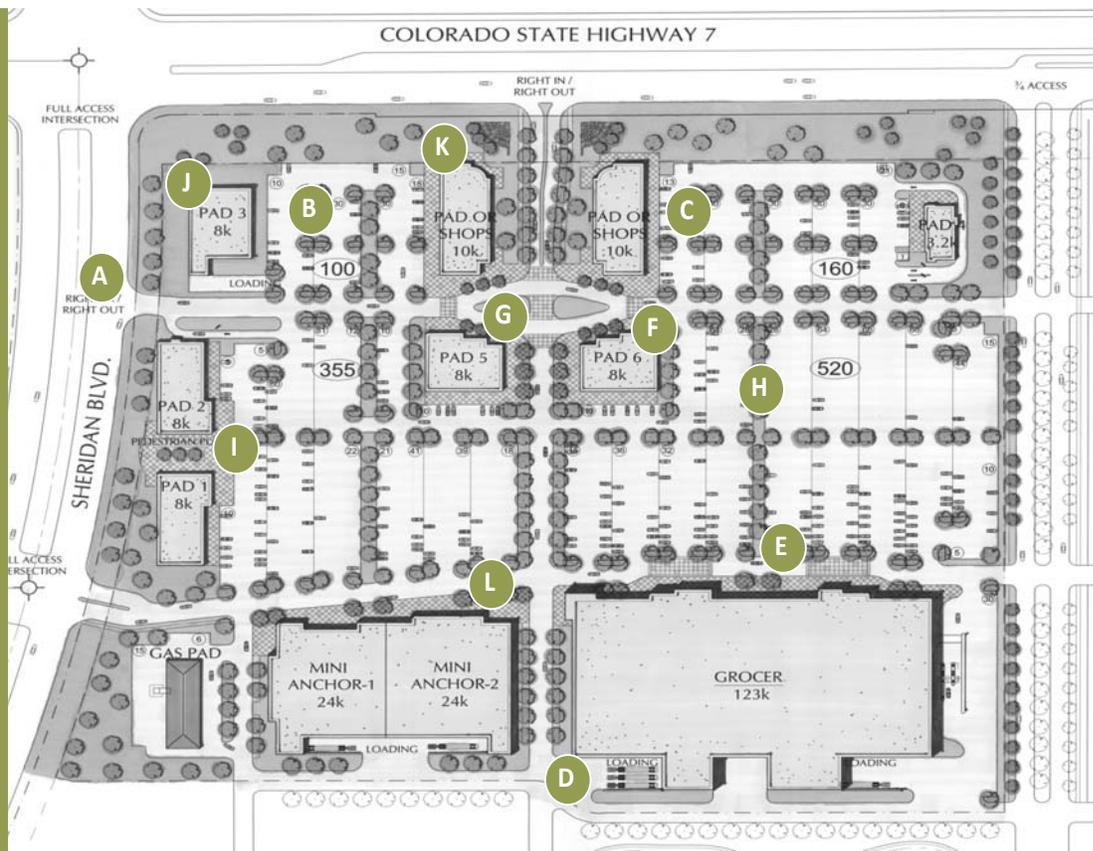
Orient loading docks towards the side or rear of Large Format buildings, screened from public view.
